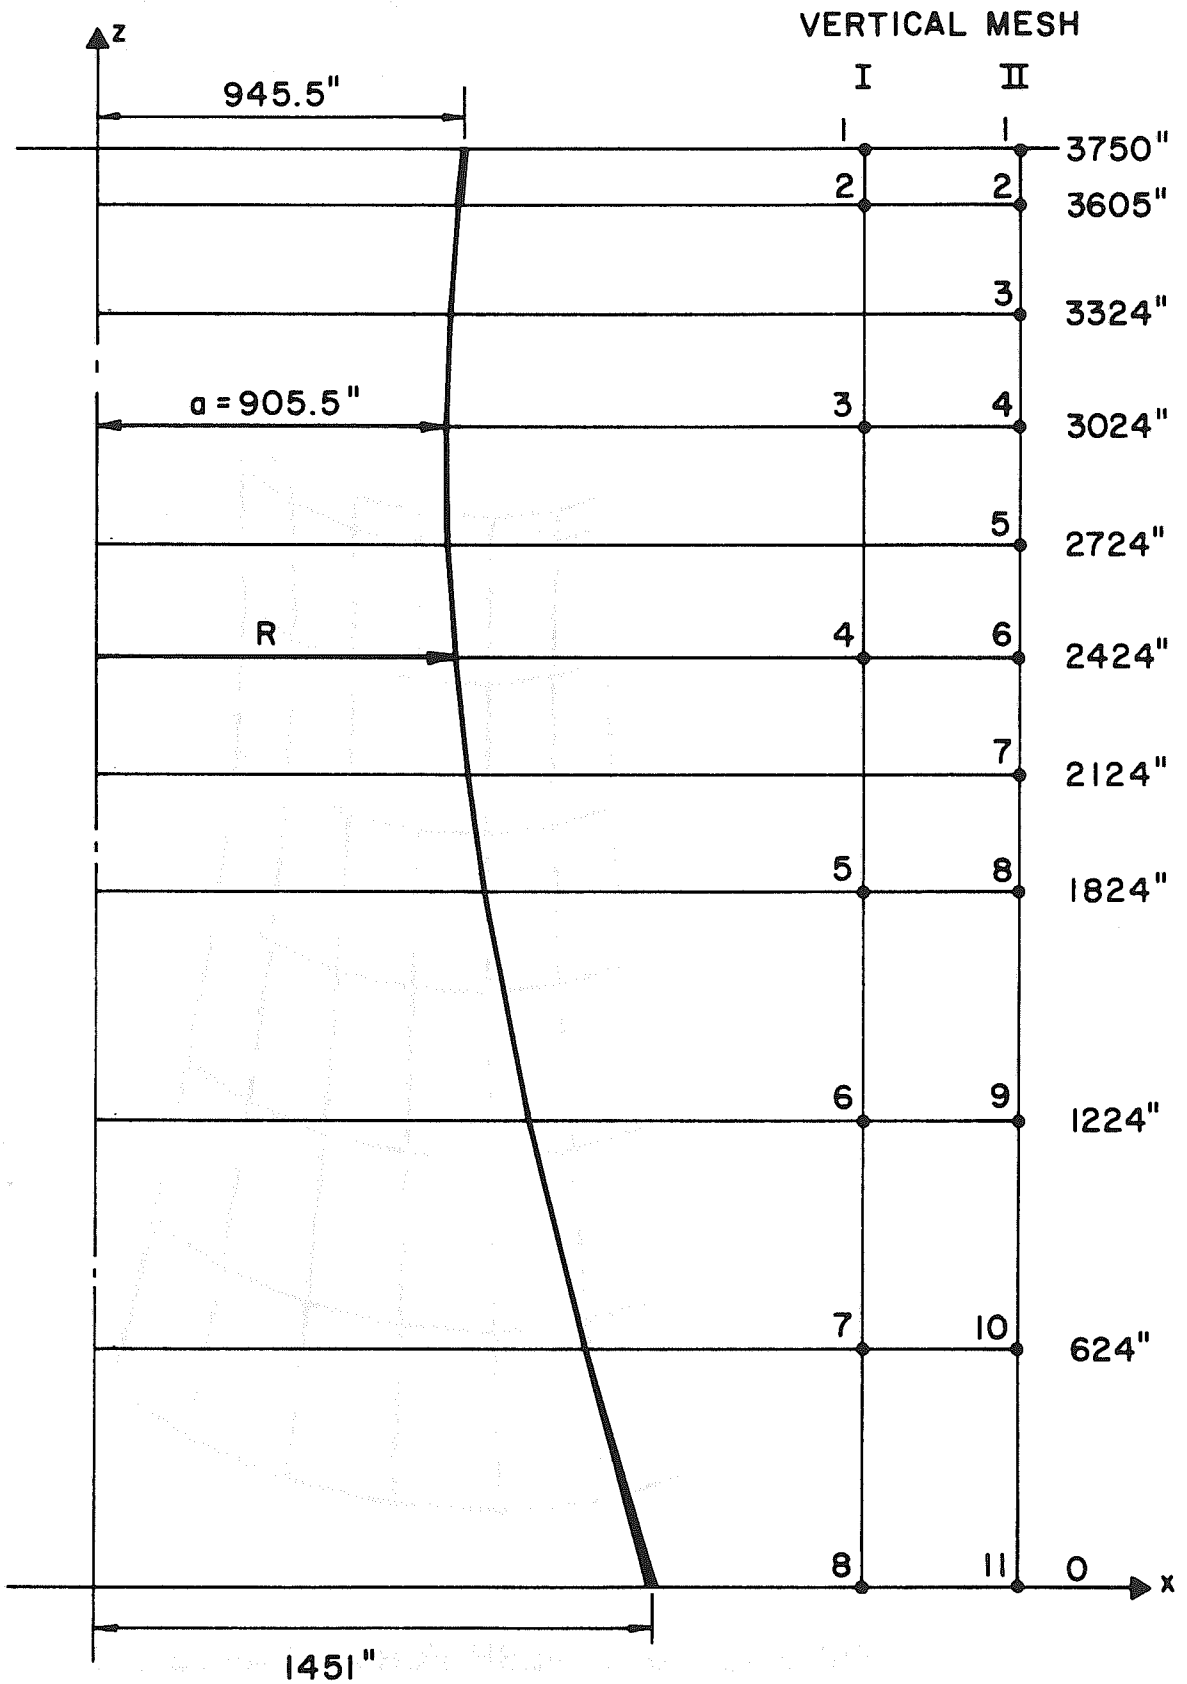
COOLING TOWER PROFILE AND VERTICAL MESH LAYOUT
